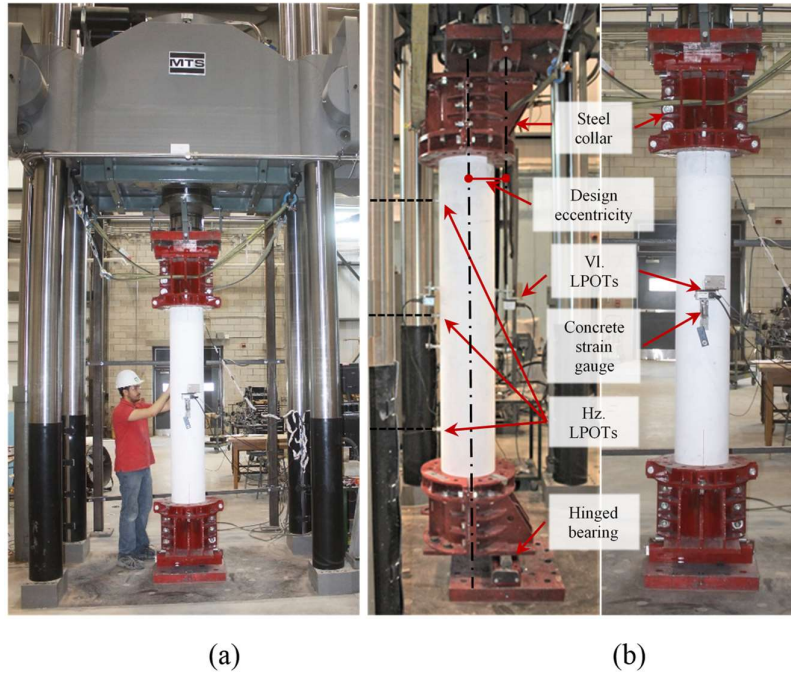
Testing plan: (a) Connecting the external instrumentation, (b) Test-setup components.
